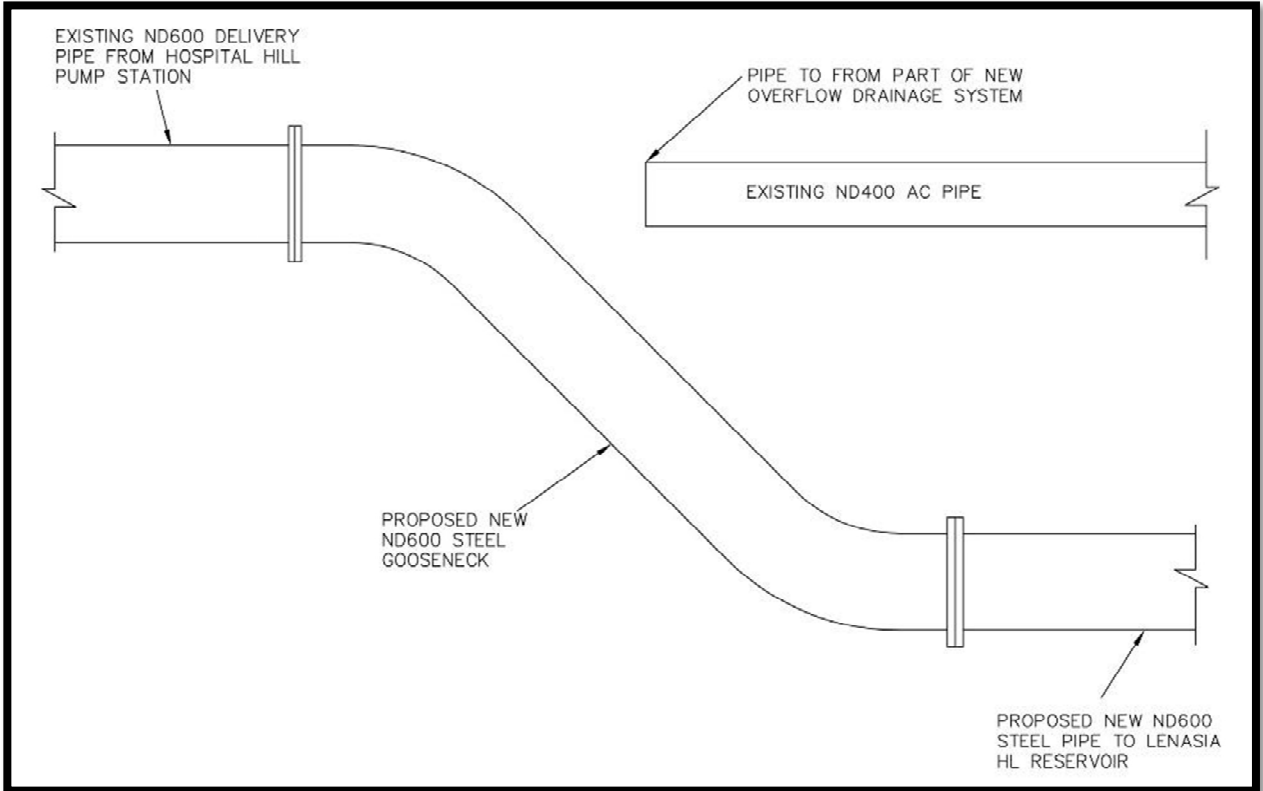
Connection of new steel pipeline to existing pipe at Hospital Hill pump station
